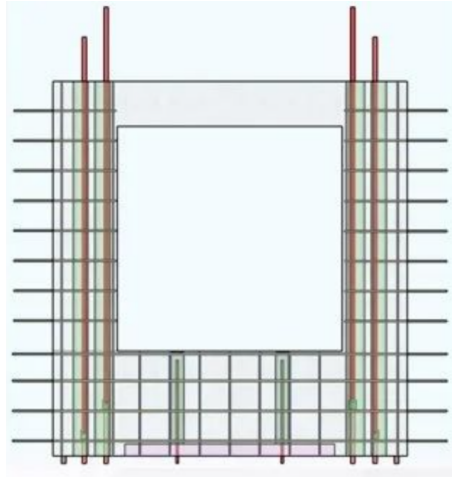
EMC Schematic diagram of the EMC precast hollow-core composite shear wall structure
